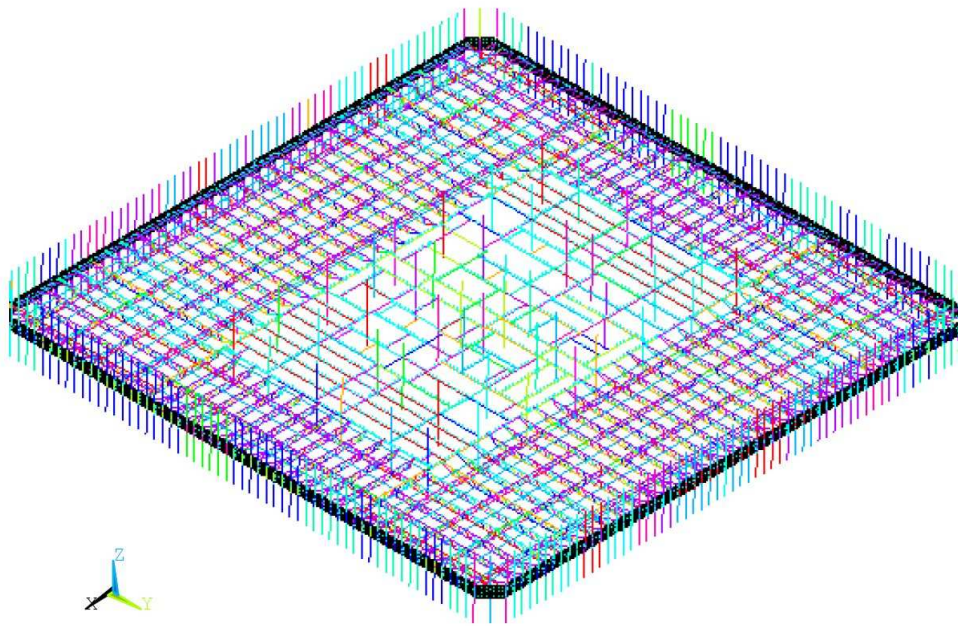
NIST Single Floor Model (Undamaged) [68]
